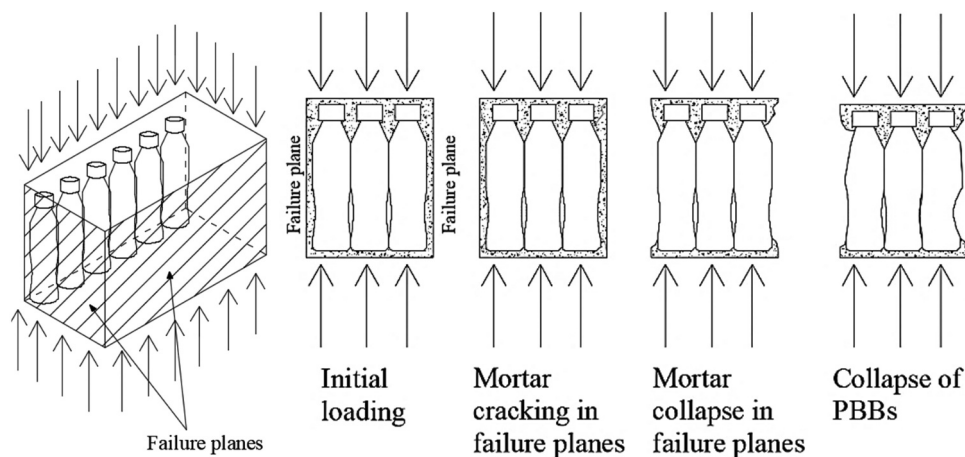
Typical failure patterns for PBB blocks in the vertical orientation.
